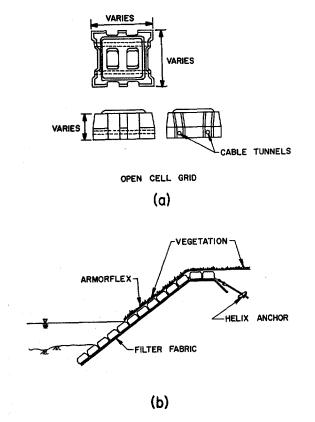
Armorflex (a) block detail and (b) revetment configuration.
